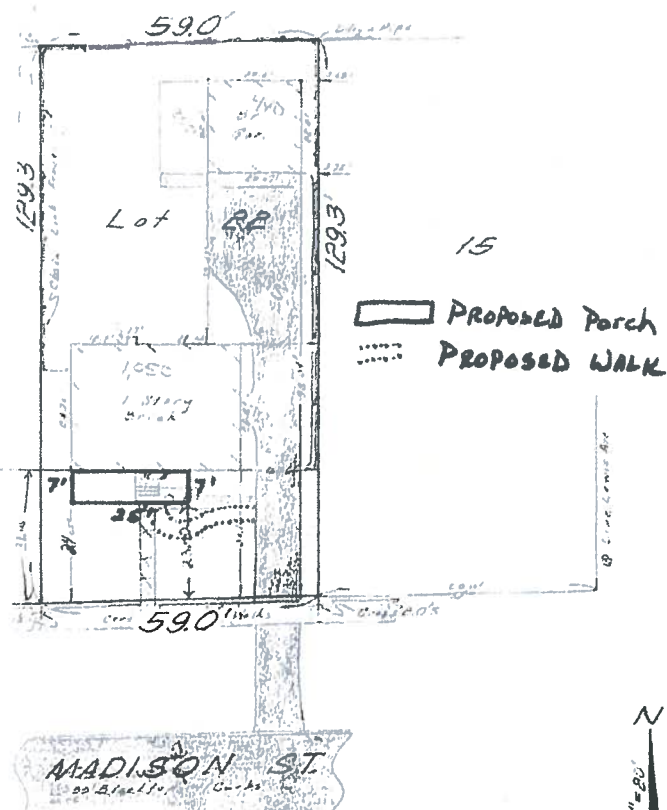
E. MADISON ST. EXISTING AND PROPOSED CONDITIONS
